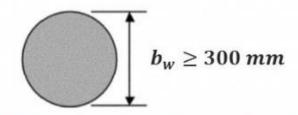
Minimum cross-sectional dimensions for circular columns.
